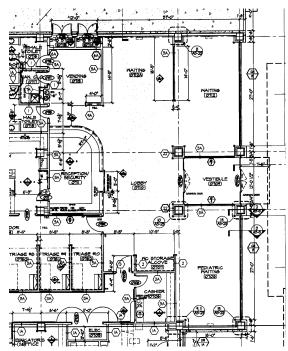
Reception and waiting area plan (dwg A1-0B)
